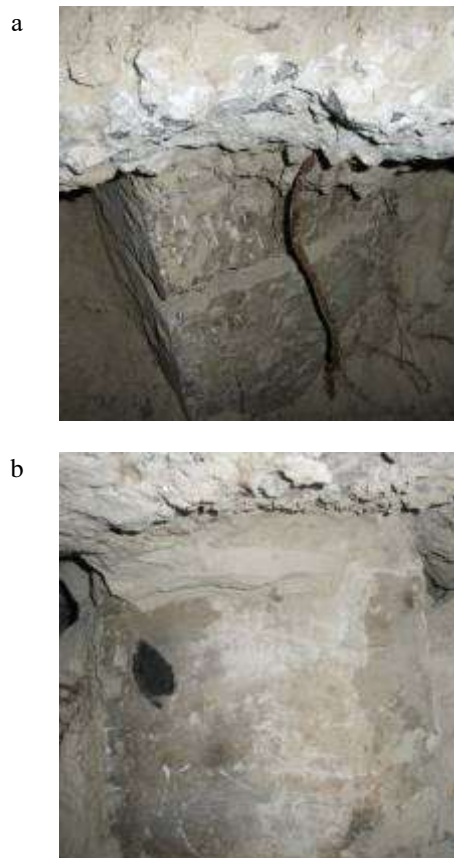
The piles view as a part of the grid: a – №1 (pile №119); b – №2 (pile №105)
